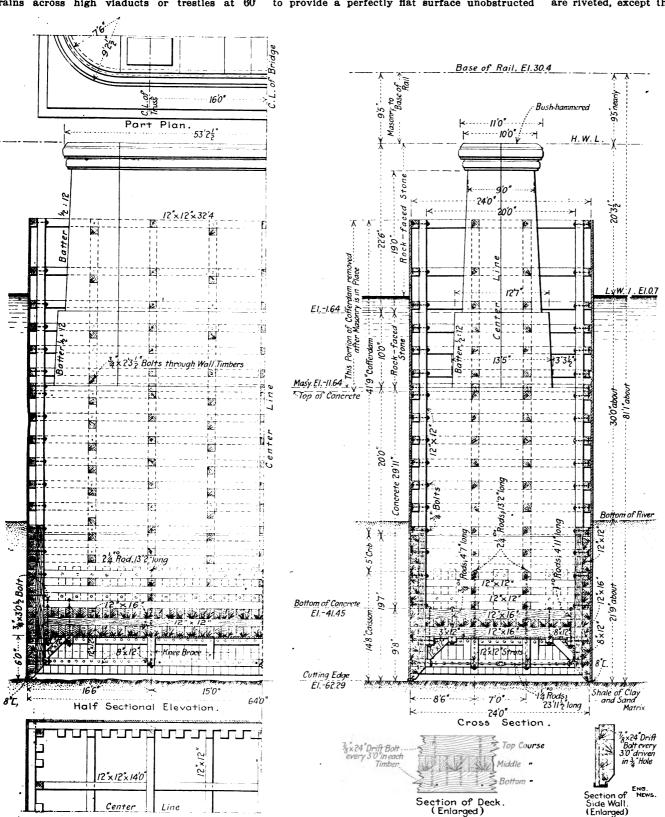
CAISSON, COFFERDAM AND MASONRY FOR PIER NO. 26 (WEST CHANNEL) OF THE NEW CLINTON BRIDGE.
